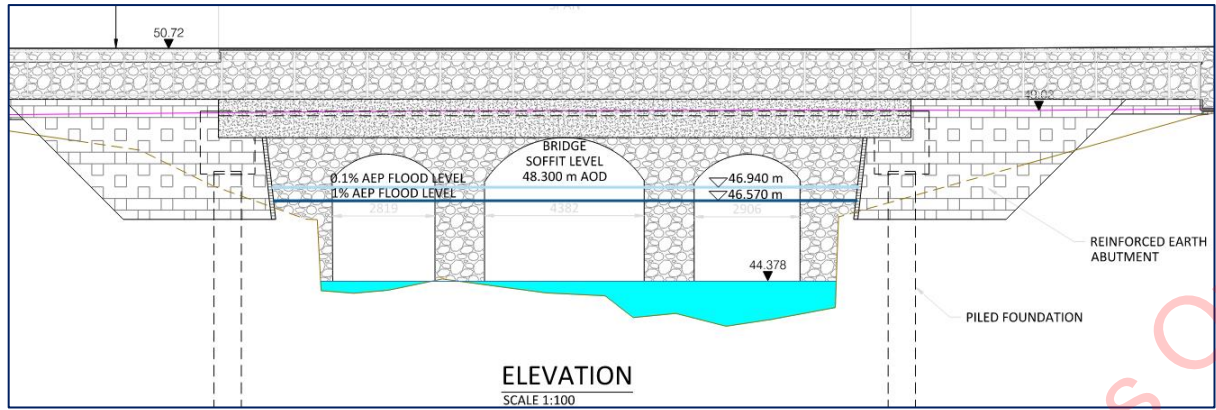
Proposed Pedestrian / Cycle Bridge (Elevation)
